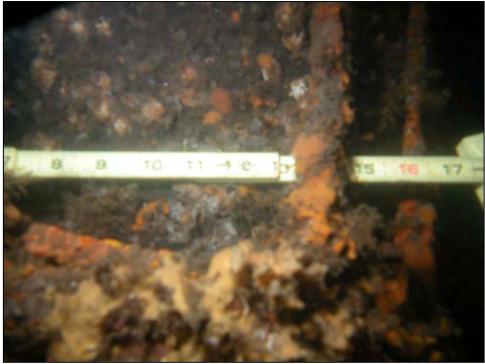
Typical view of the exposed steel reinforcement cage at the location of the missing concrete pile jacket. (Photo by Childs Engineering Corp.)
